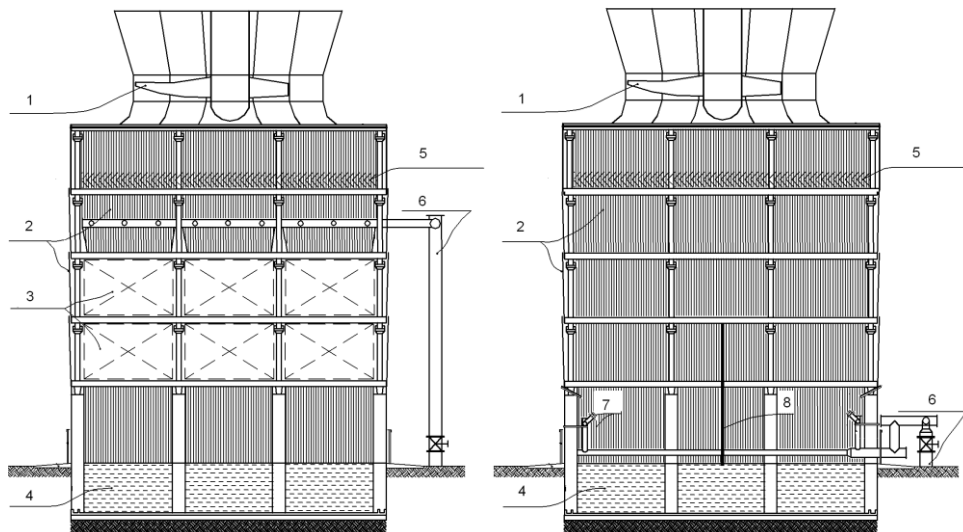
Schematic of the forced draft cooling tower with fill (left) and nozzles (right):
